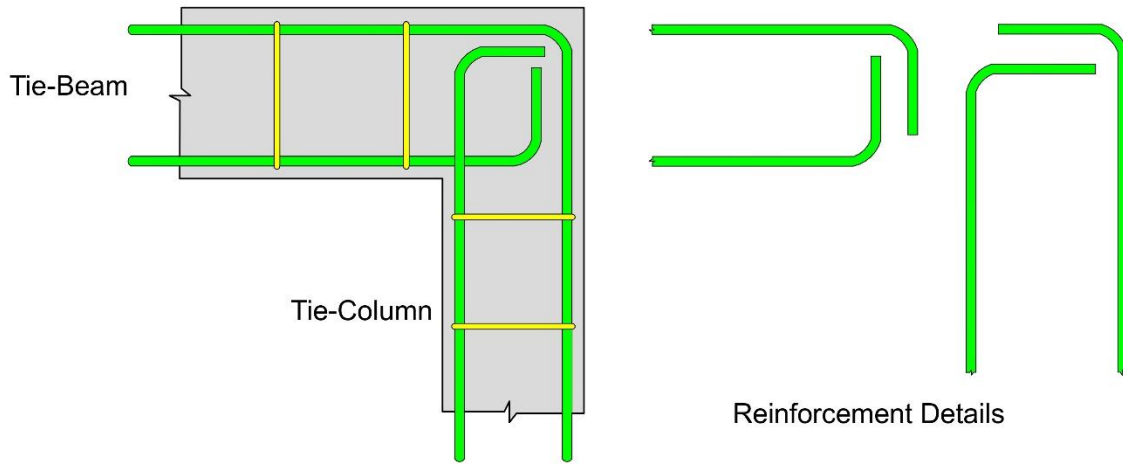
ANCHORAGE OF LONGITUDINAL REINFORCEMENT OF TIE-COLUMN AND TIE-BEAM
